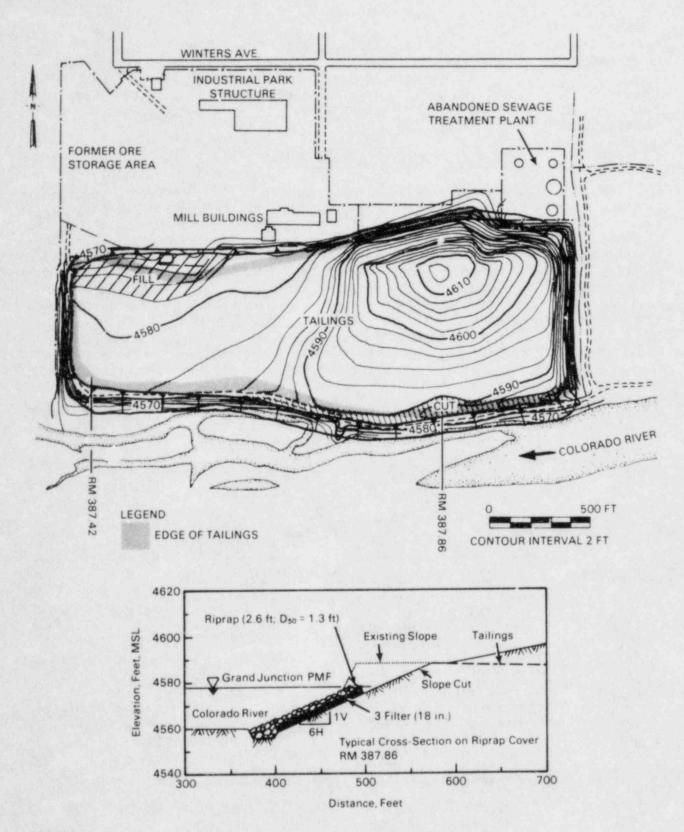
Grand Junction Impoundment - Plan View and Typical Cross Section of Riprap Cover
